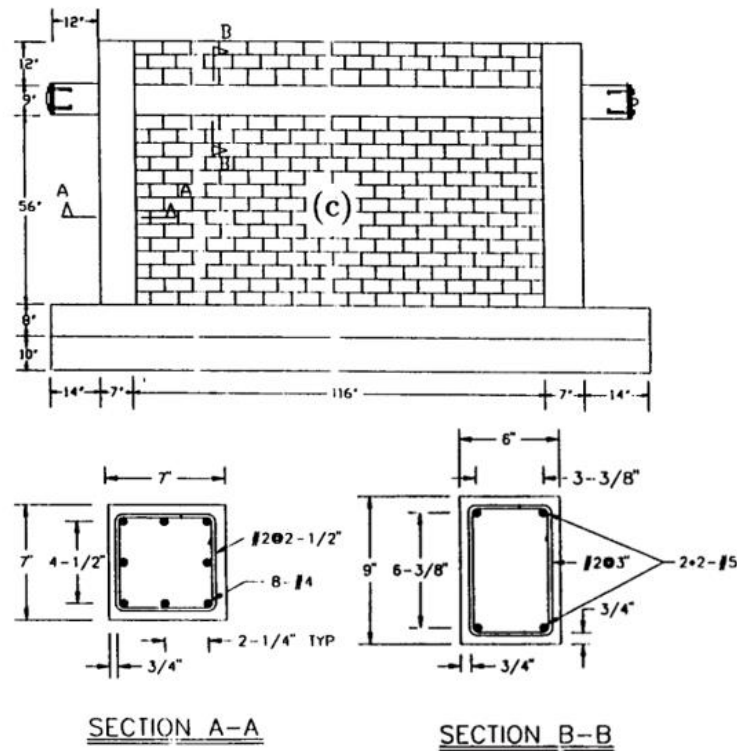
Design of weak frame test specimen 11, $h/l = 0.48$ (measure in inch, 1 in. = 25.4 mm) [15].
